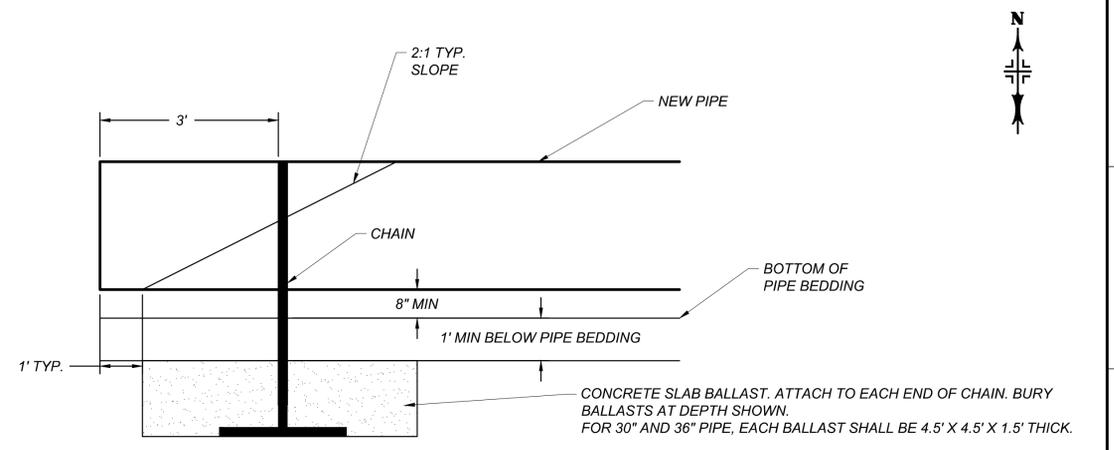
TYPICAL HDPE CULVERT TRENCH DETAIL
